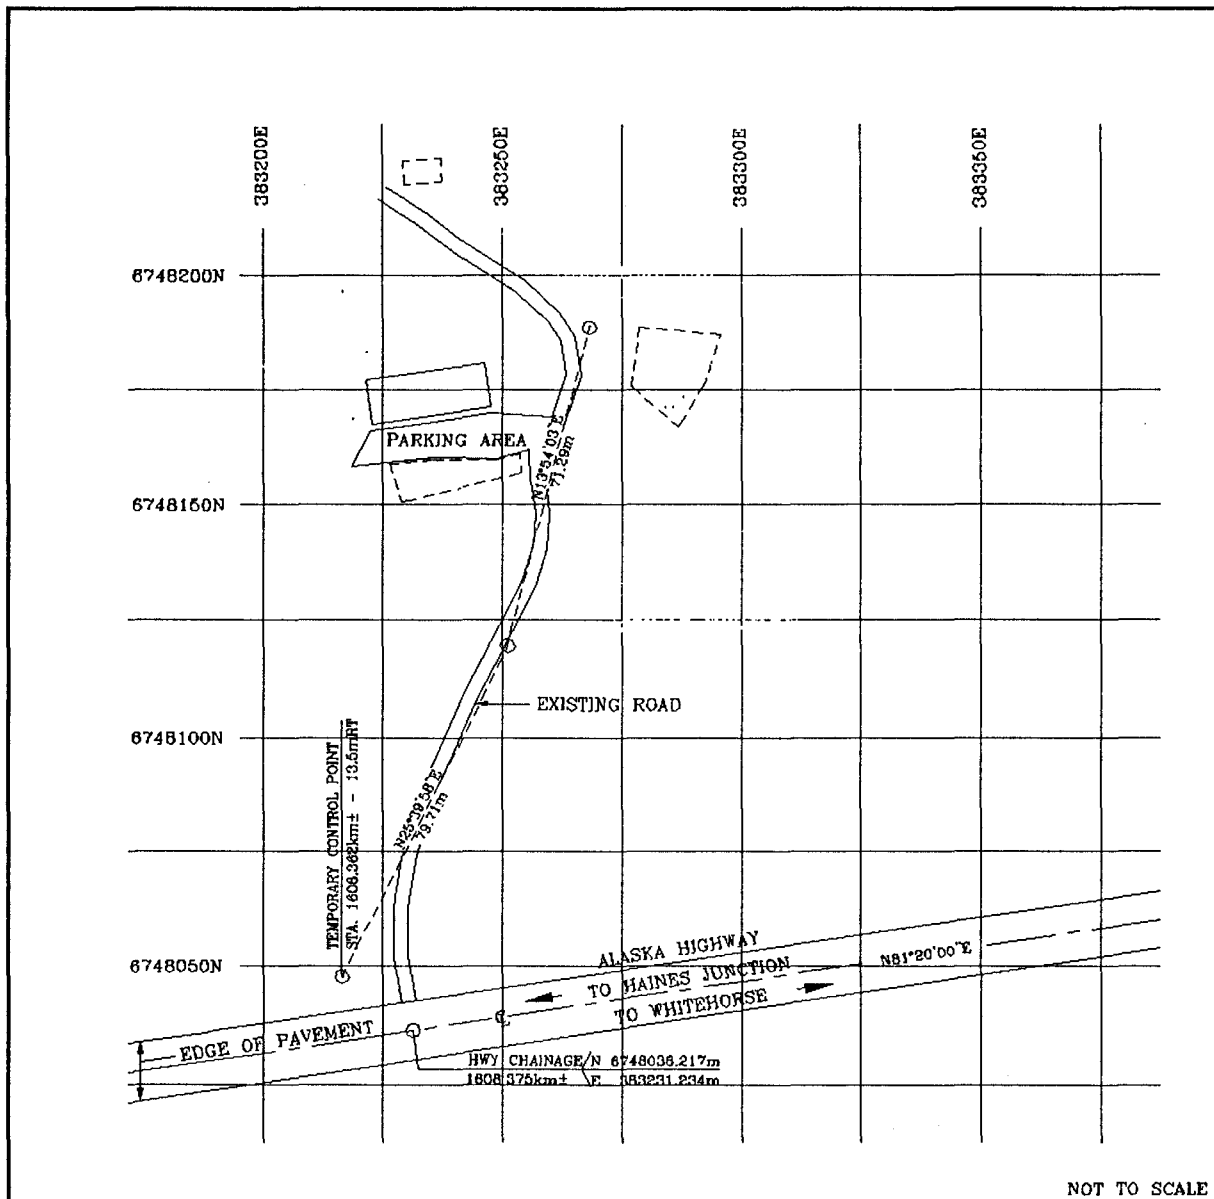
Detailed site plan for sub-site 20A - CANOL Pumping Station C at Canyon Creek site
